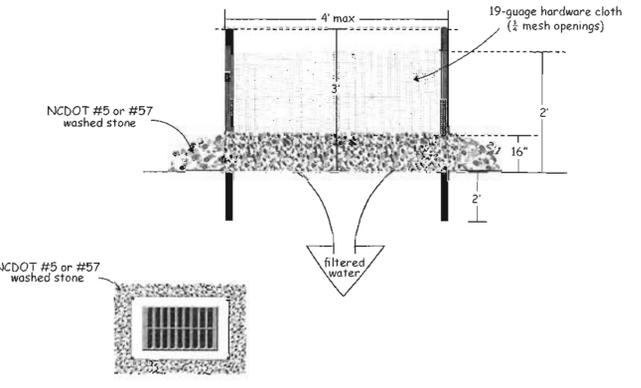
Plan view and cross-section view of a temporary sediment trap.
